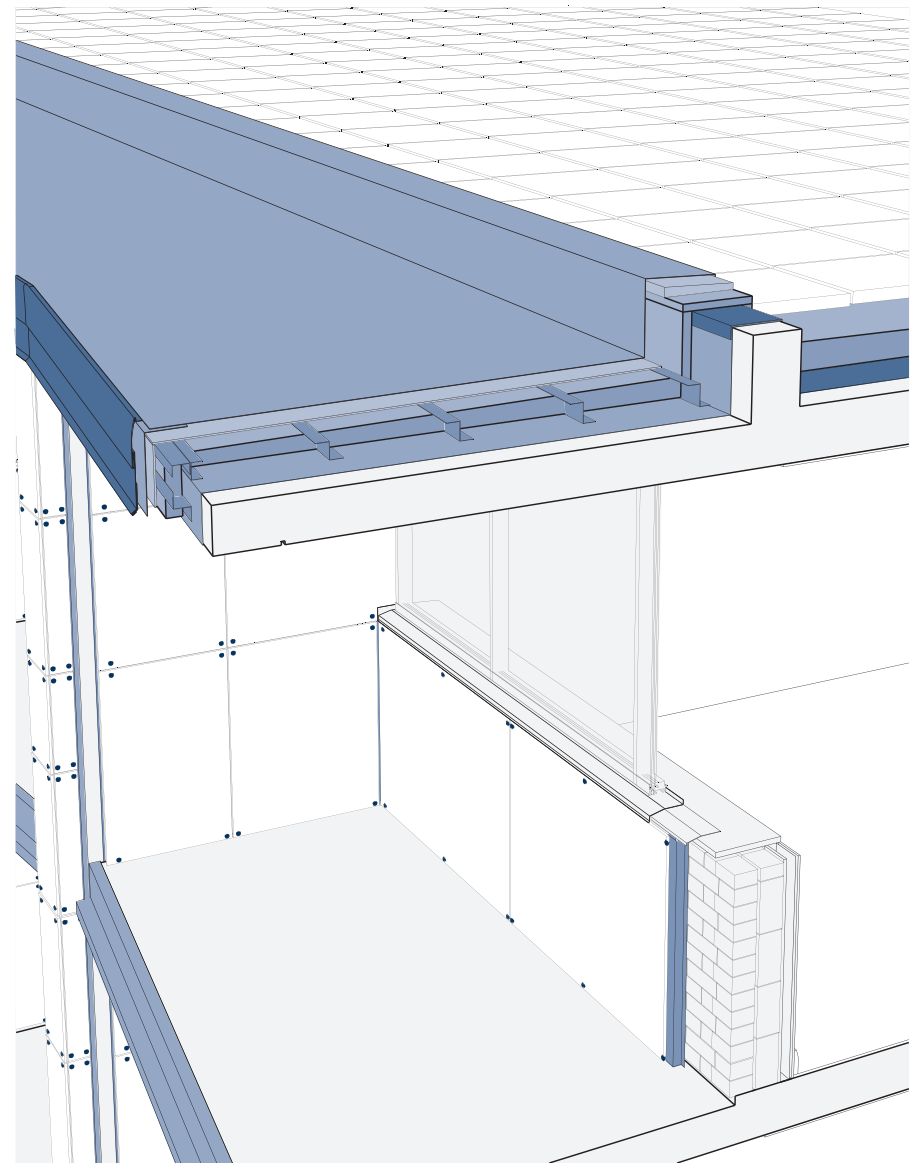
Flashings are installed at the projecting roof slab edge. A roofing membrane is laid over the projecting roof area and lapped over the parapet and the flashing. Pavers are laid on top of the spacers in the main roof area.
